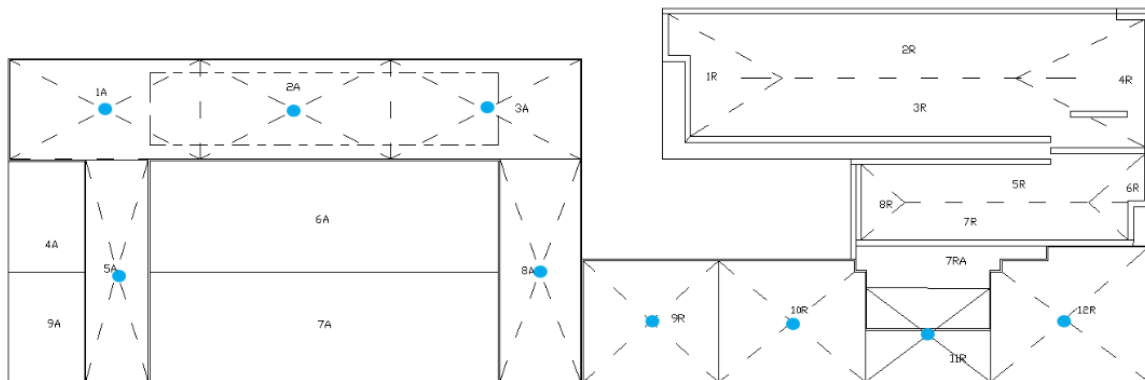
Main Gutters distribution in the building (roof - plan view)
